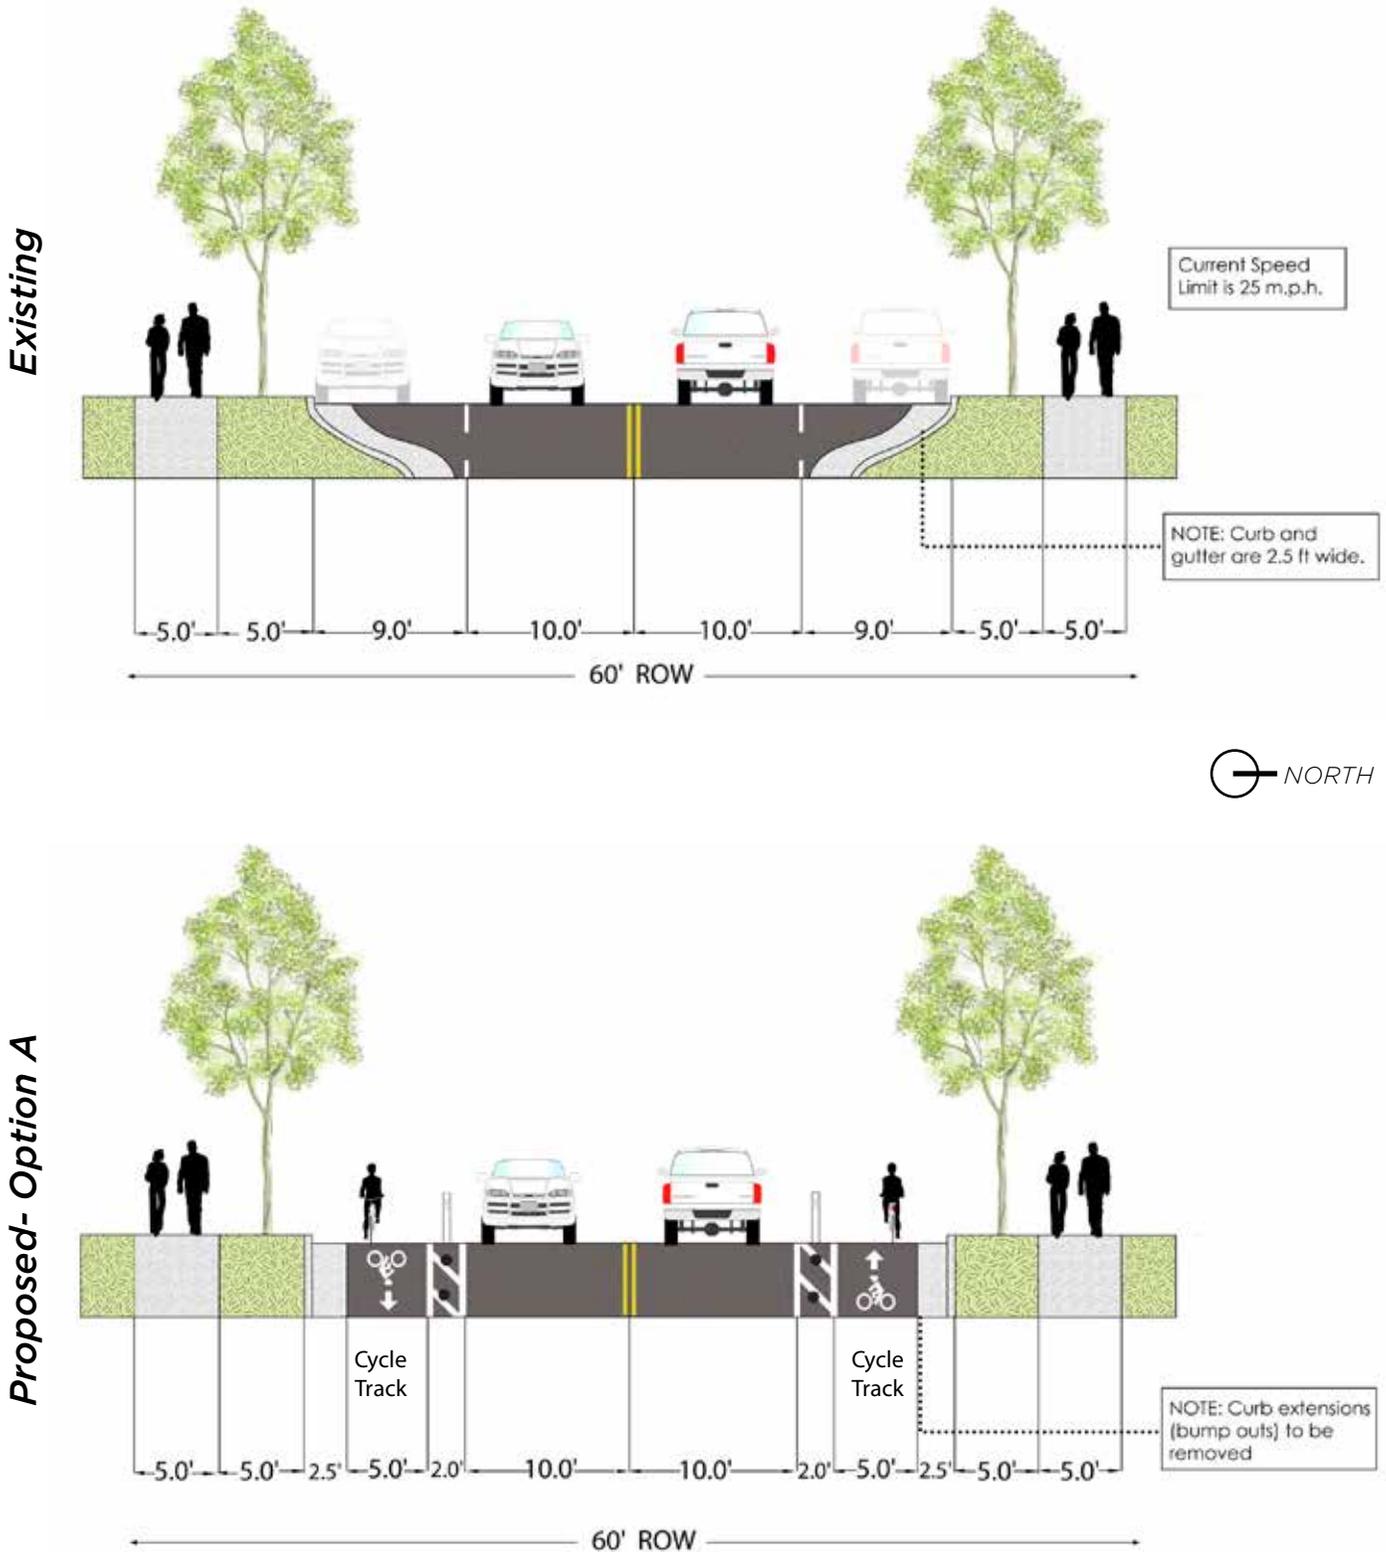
Jetton Road Extension existing undivided 2-lane with parking to proposed 2-lane Reconfiguration Concept- Option A with Protected Bicycle Lanes
